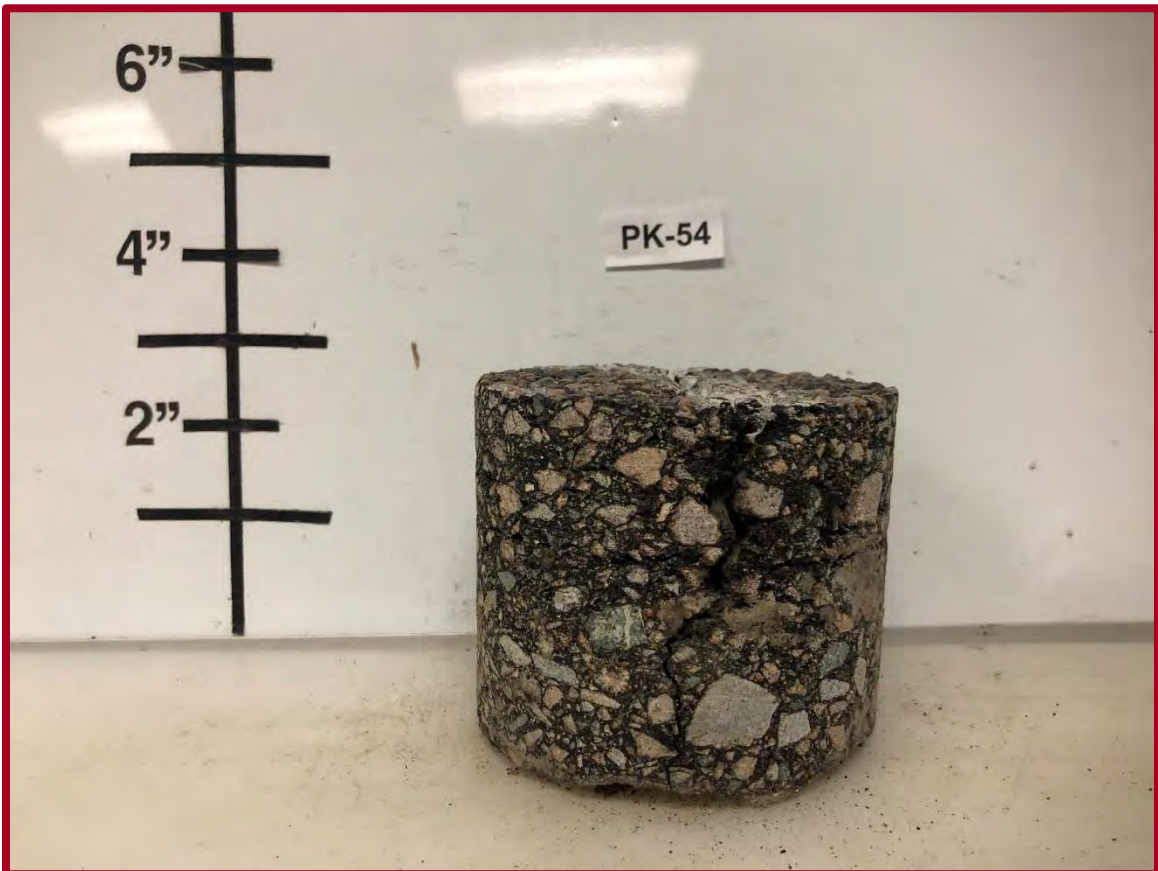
PHOTOGRAPH OF PAVEMENT CORE PK-54
